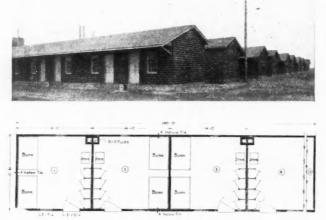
Front and End View and Floor Plan of Negro Shacks of Bethlehem Steel Co.
